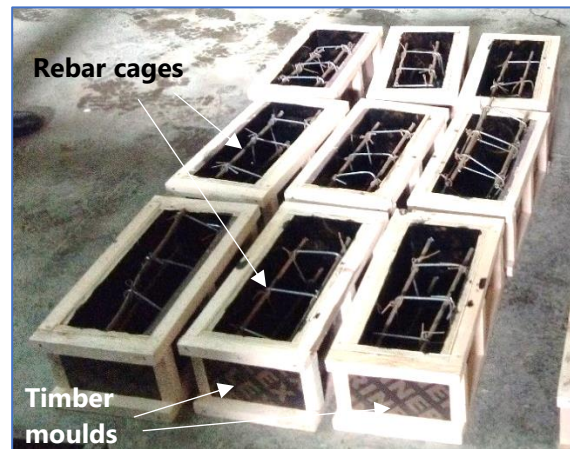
Setup for the manufacture of reinforced concrete specimen.
